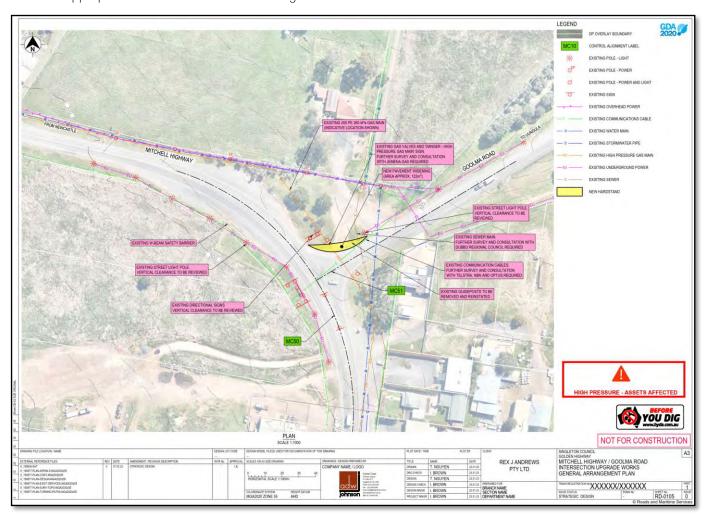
Proposed Upgrade Works at Mitchell Highway / Goolma Road
